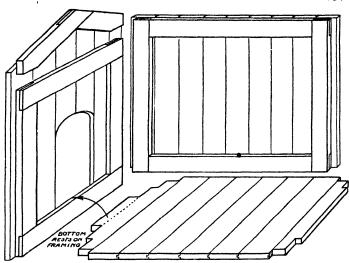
End and Side Frames with Floor Ready for Bolting.
